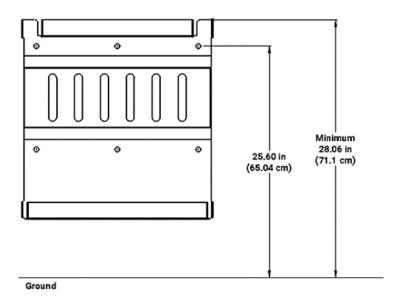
WallMount Installation with Conduit Box Steps 1 & 2
